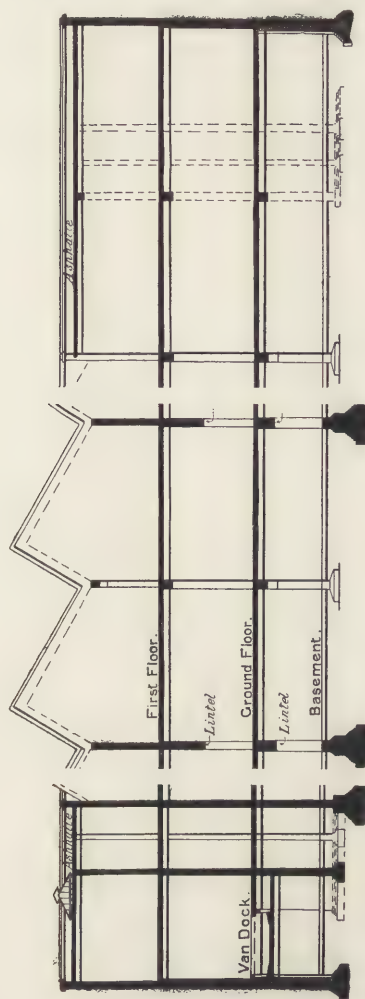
Longitudinal Section on line AB (Fig. 83).
